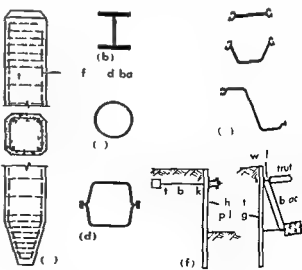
Pile designs (a) Precast concrete pile (b) Pipe pile (c) Box pile (d) Sheet pile (e) Sheet pile with waler and tieback
